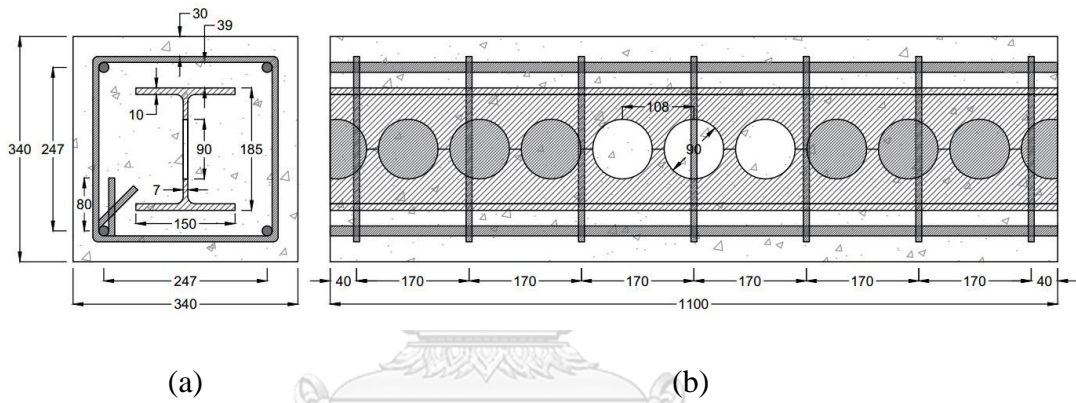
Reinforcement details of C3-170 (A) and C3-170 (B) columns; (a) cross-section; and (b) longitudinal section (dimensions in mm).
